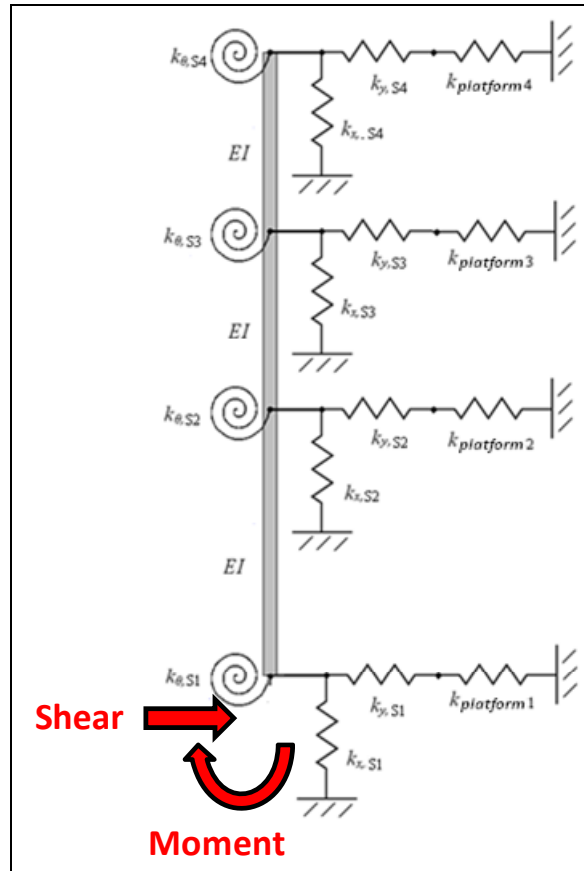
MATLAB Model of the Gripper and Guide Arrangement
